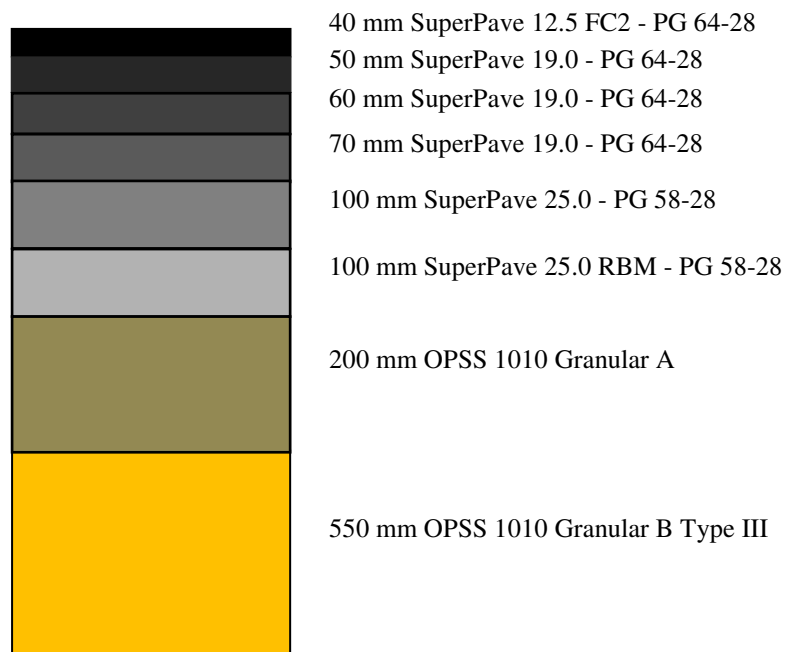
RBM Perpetual Pavement Design Layer Thicknesses
